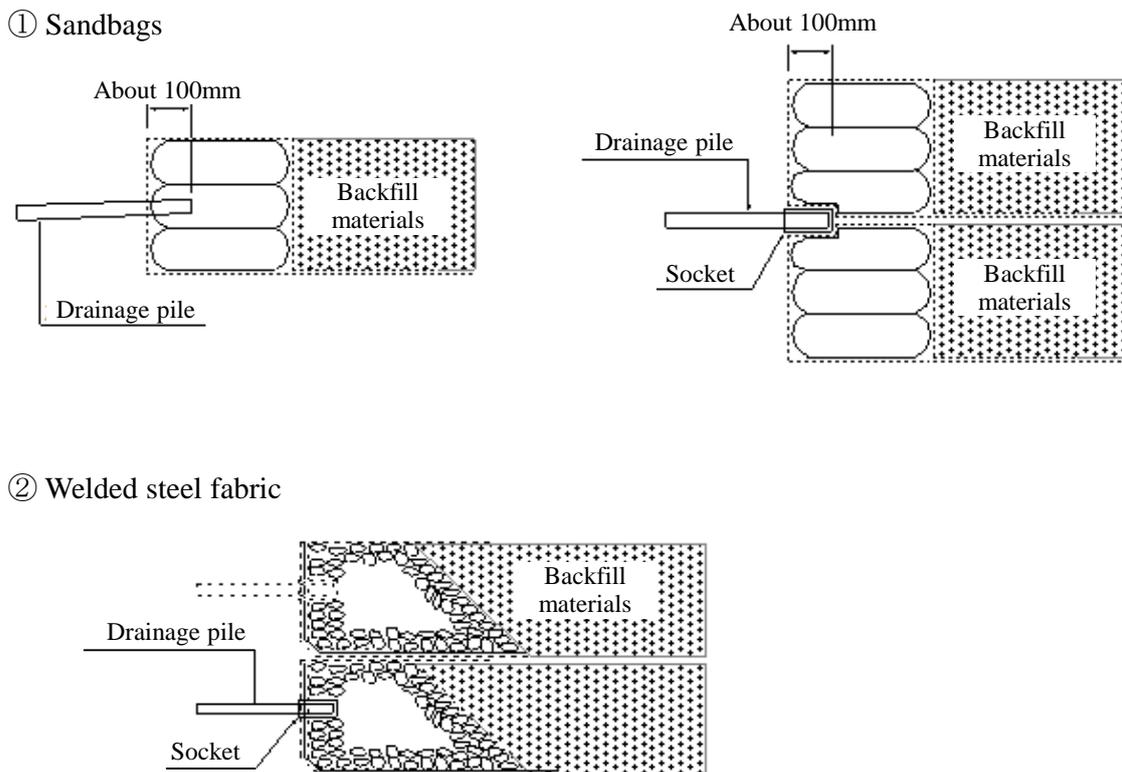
Typical arrangement of drain pipe at the back face of the wall facing
